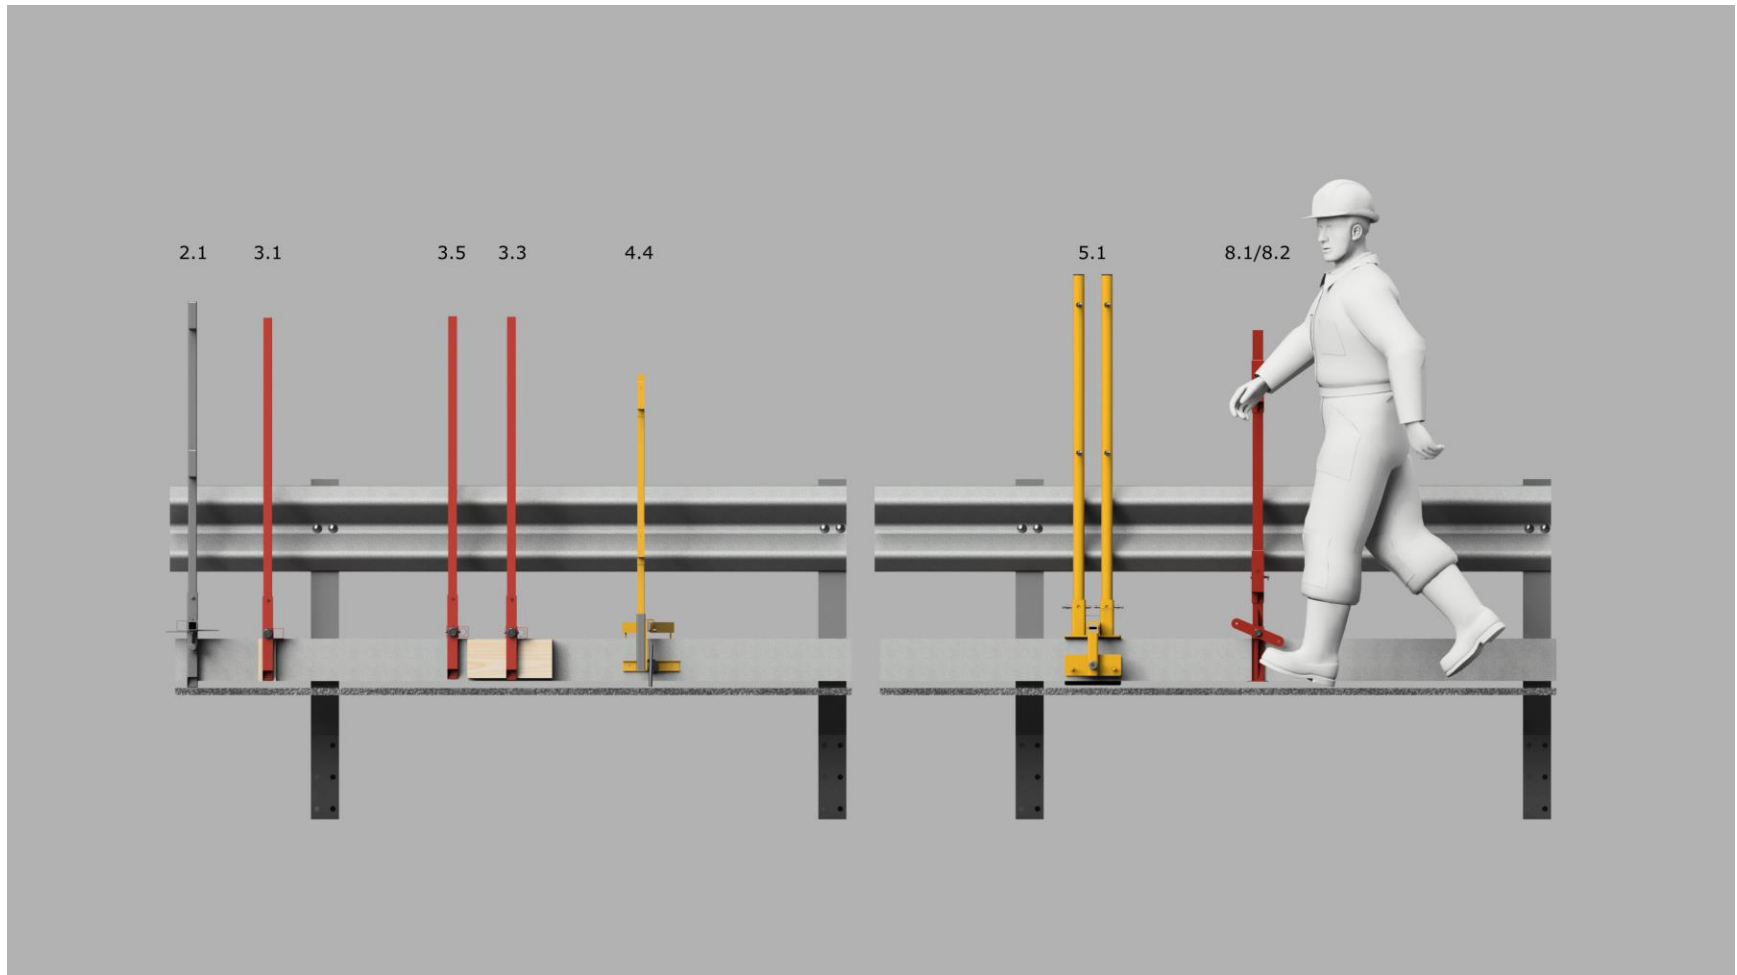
Guardrail Type 23, wheel guard fit; view from the east
